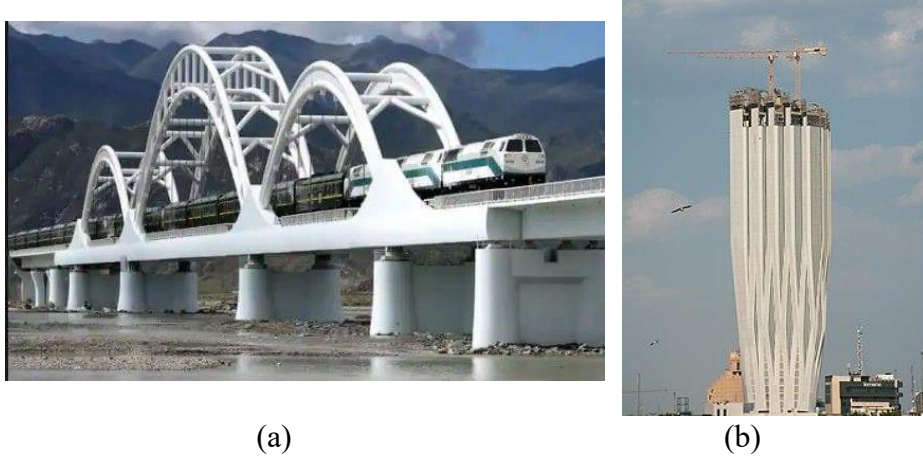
a: Qinghai-Tibet railway bridge and b: building of the Central Bank in Iraq
